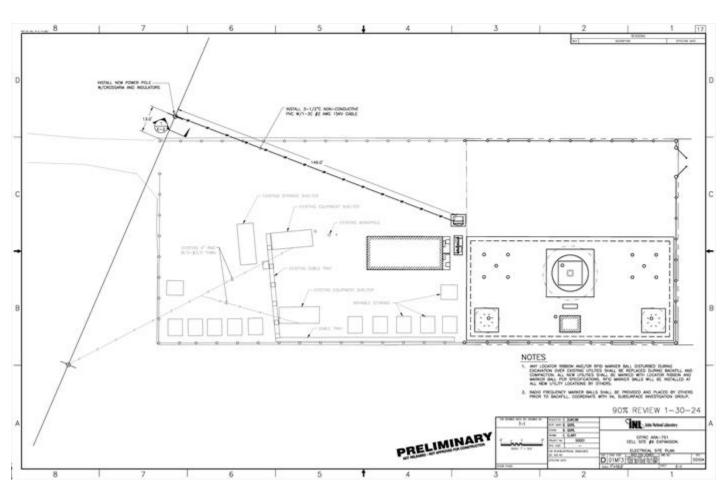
, Rev 1: Excavation trench (electric) outside of existing gravel pad.
